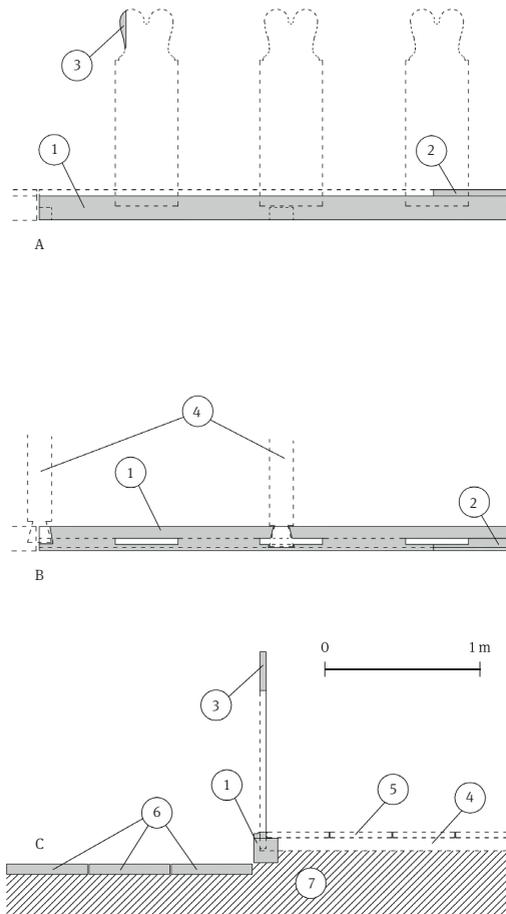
Reconstruction attempt of the previous pew system: A – side view with pew ends, B – plan, C – section, 1 – preserved edge beam with dovetail joints for crossing joists and rectangular joints for pew ends, 2 – profiled corner strip fragment with wear marks between the pew ends, 3 – preserved fragment of supposed pew end, 4 – crossing joist with dovetail joint, 5 – floor boards under the pews, 6 – limestone floor slab, 7 – soil.
